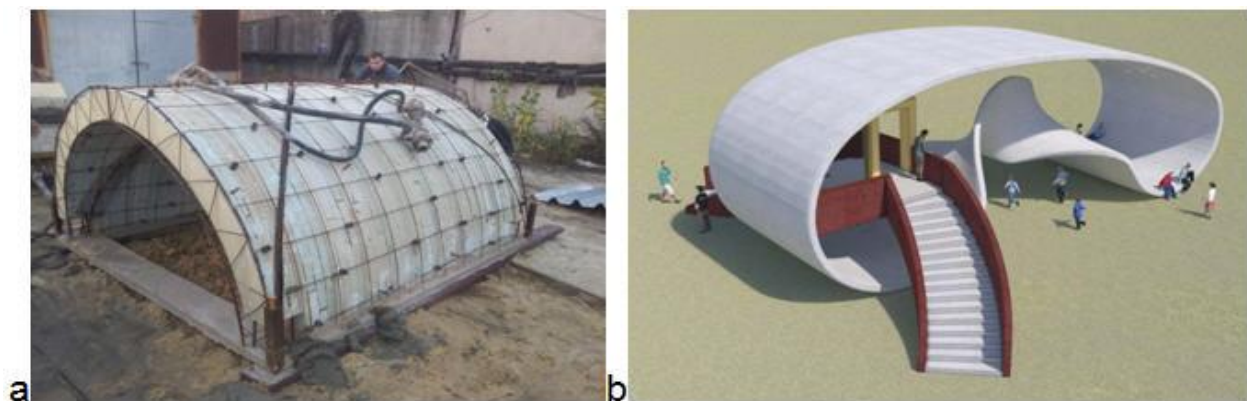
Architectural forms, constructed without the use of formwork: a – self-supporting frame with inserts made of polystyrene foam; b – complex architectural form for multiple usage
